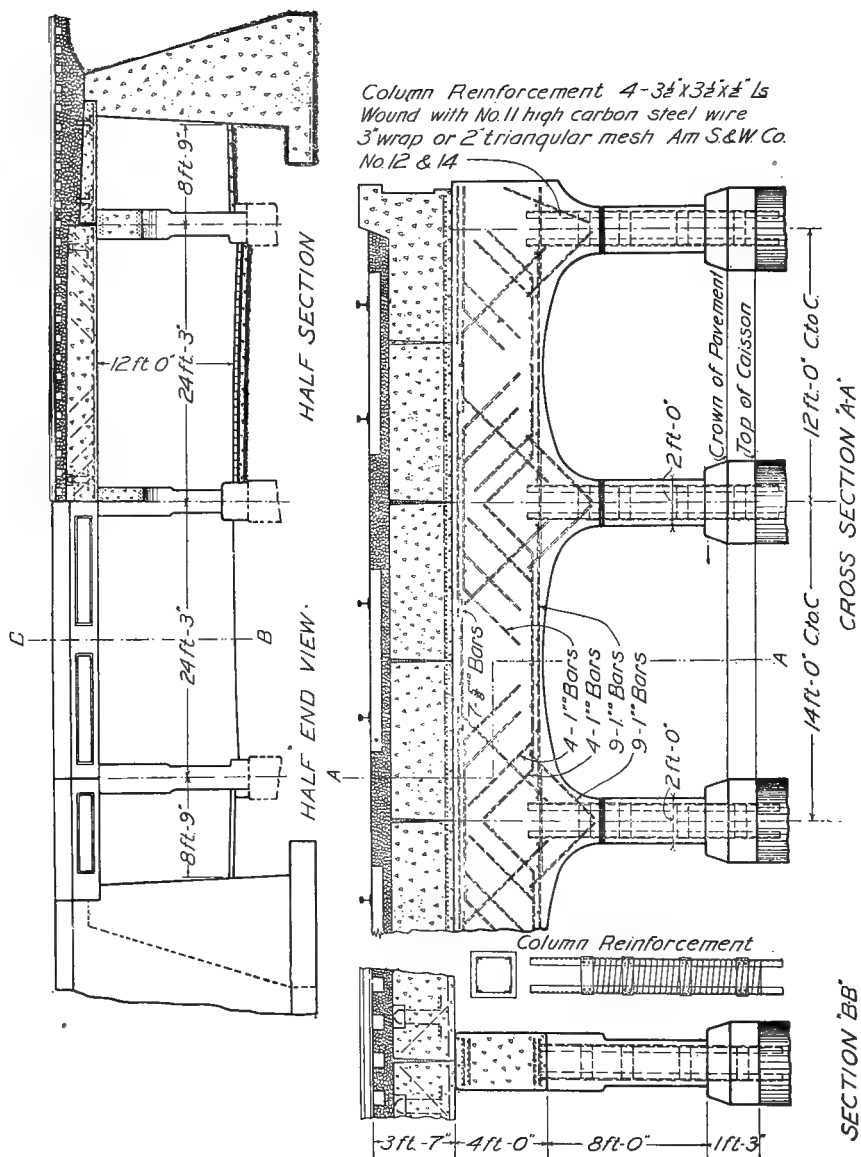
TYPICAL DETAILS, C., B & Q. R. R. TRACK ELEVATION.
